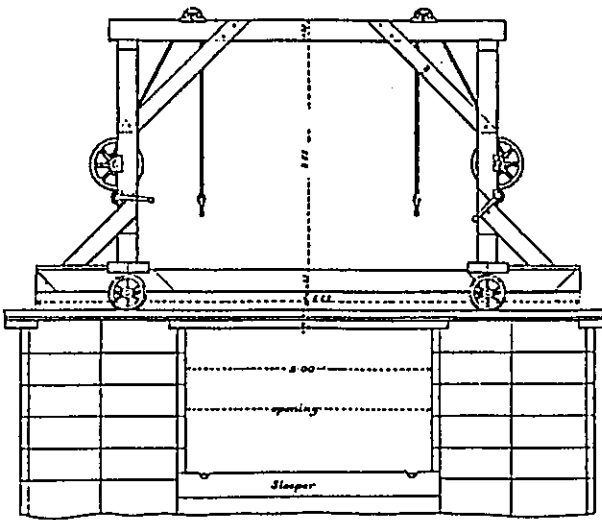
Travelling Carriage for Horizontal Sleepers. Front Elevation.
